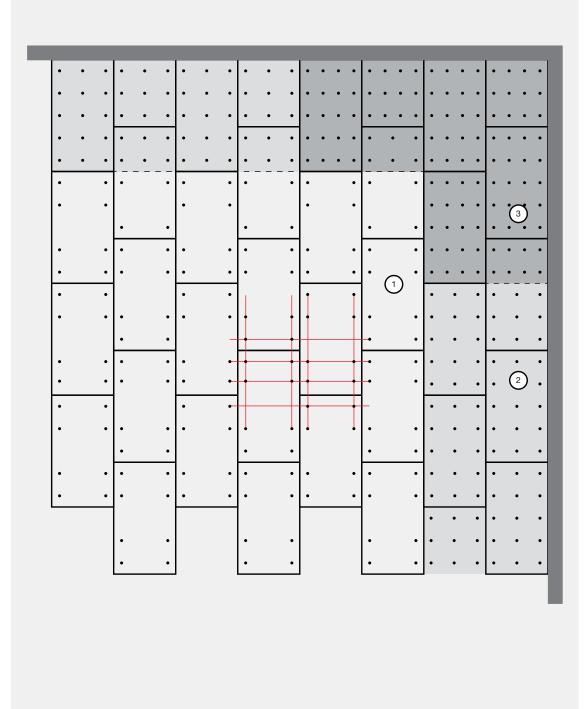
Layout pattern TPO induction welding plates
